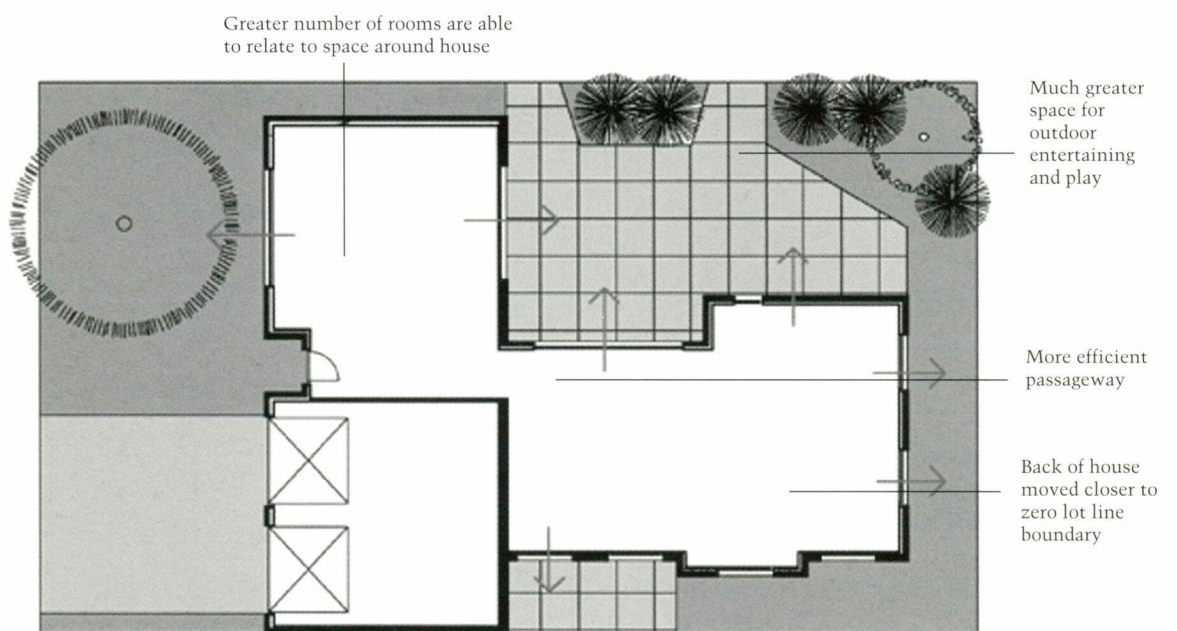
AN IMPROVEMENT TO THIS HOUSE DESIGN
